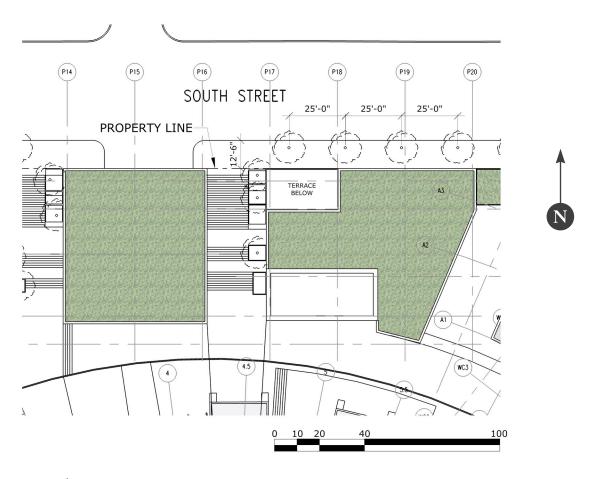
| SOUTH ST RETAIL ROOF PLAN
